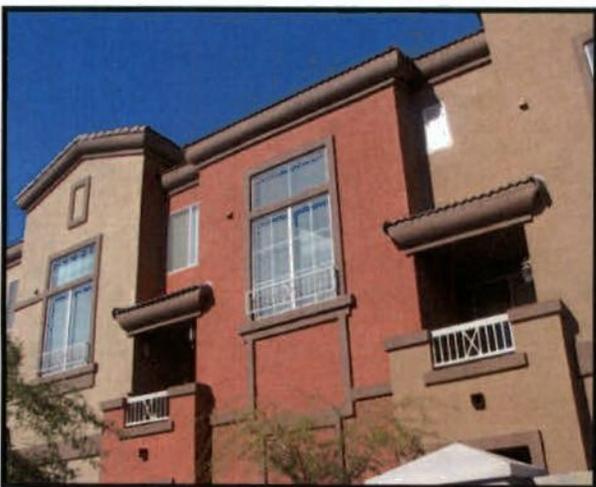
Shaped frames, sills, mullions and ornamentation add relief and interest to the façade.
